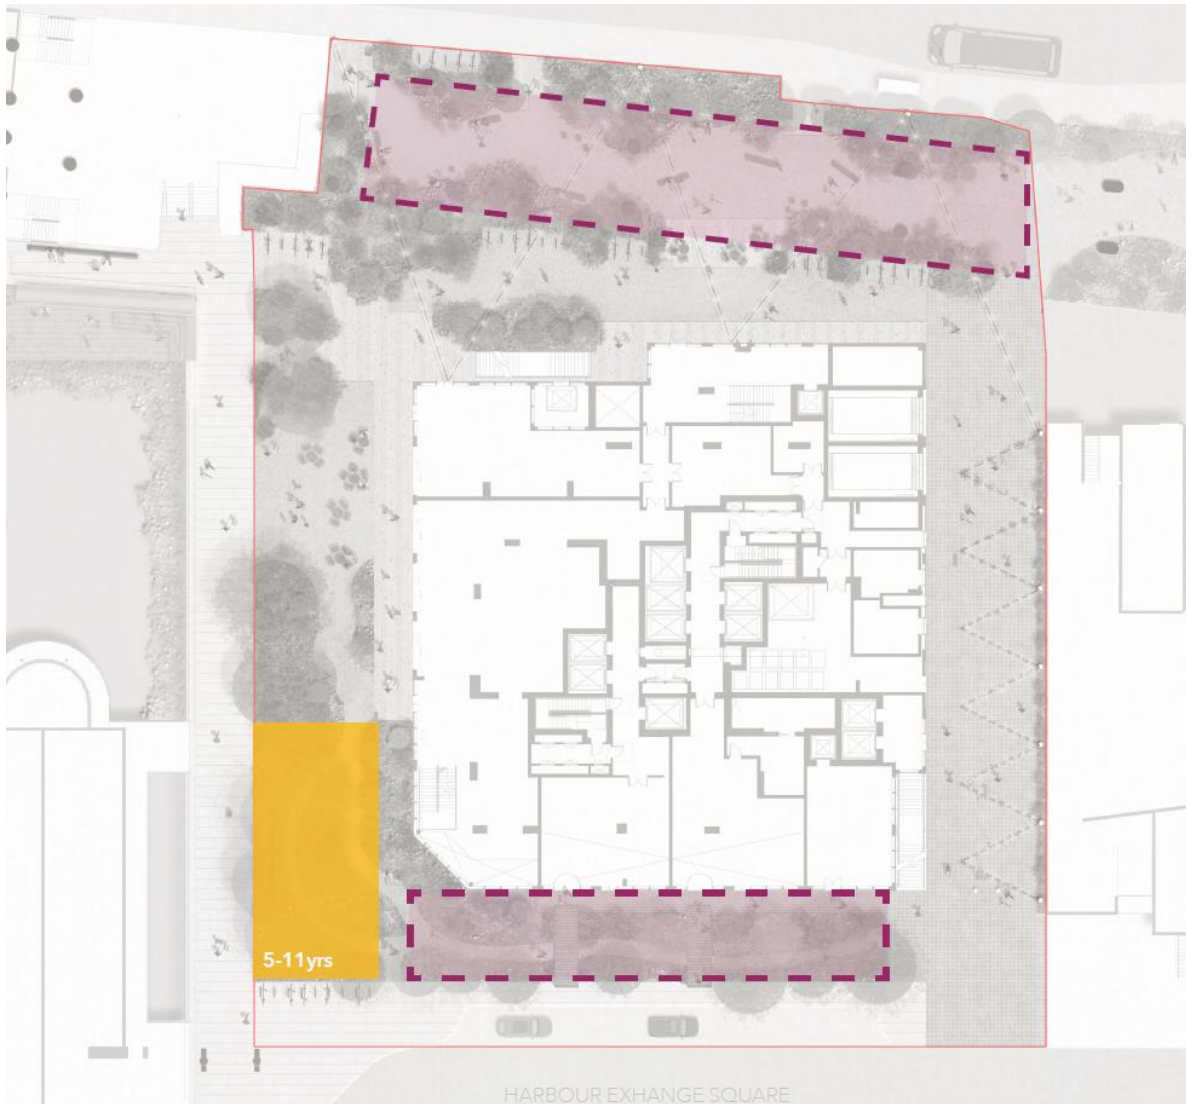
Proposed ground floor child play space with policy required space highlighted in yellow and additional incidental space shaded in purple.
